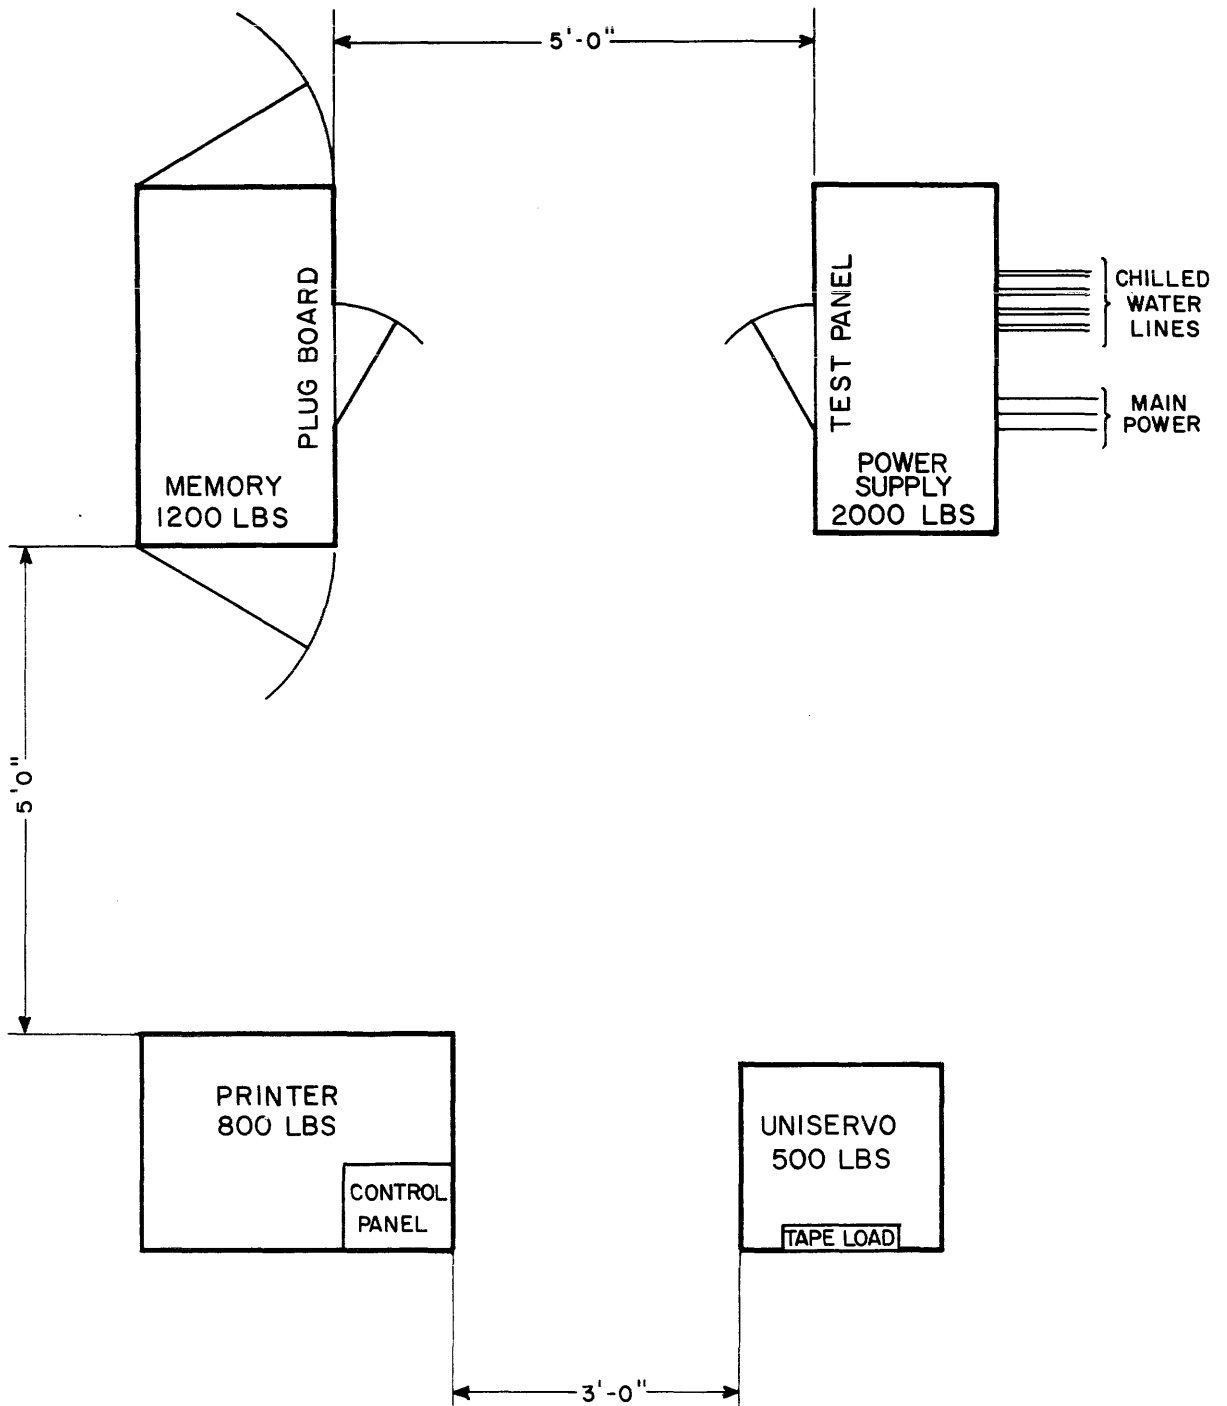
Suggested Floor Plan for High-Speed Printer Installation
